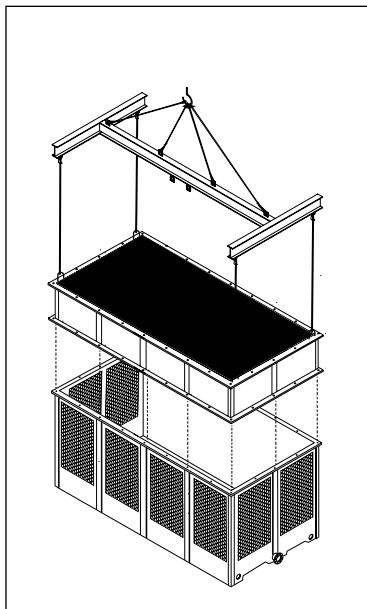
Lower body section assemble for a Modular Tower (RTM-D or RTPM-D)
